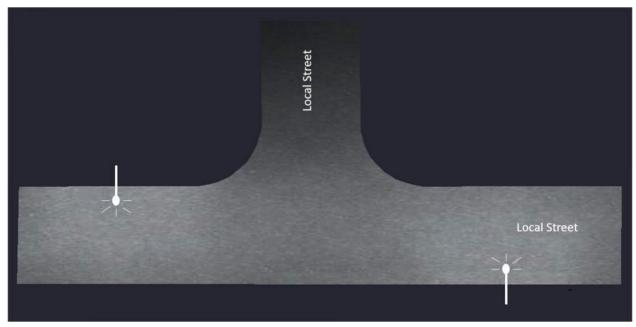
Rendering of T-Intersection: Local Street vs Local Street – Top View
